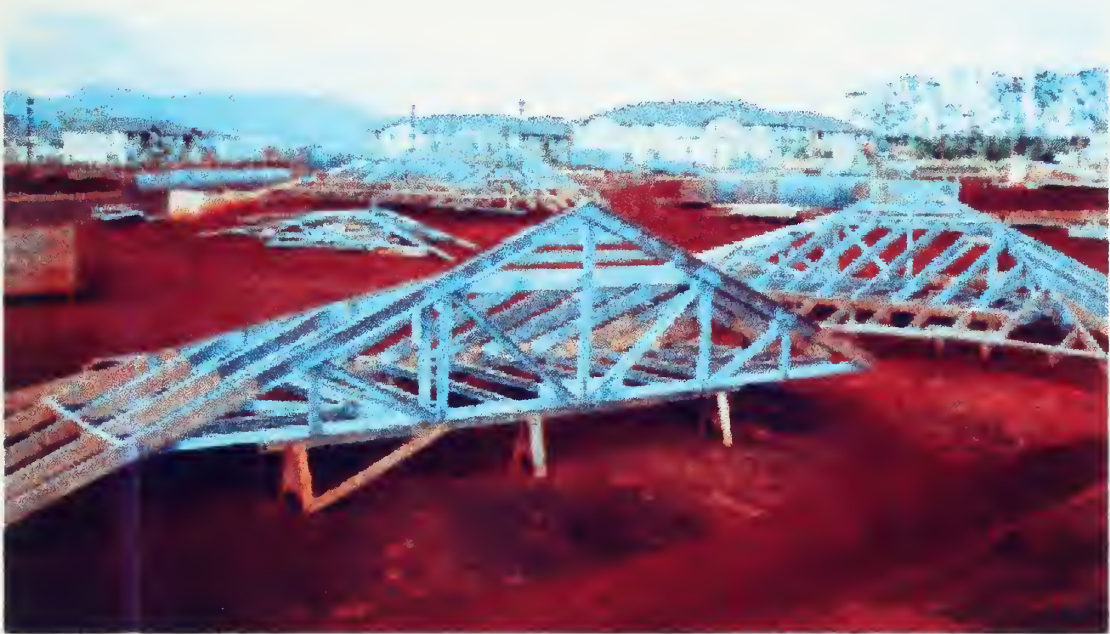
New construction, central Oahu; prefabrication; prefabricated truss systems
